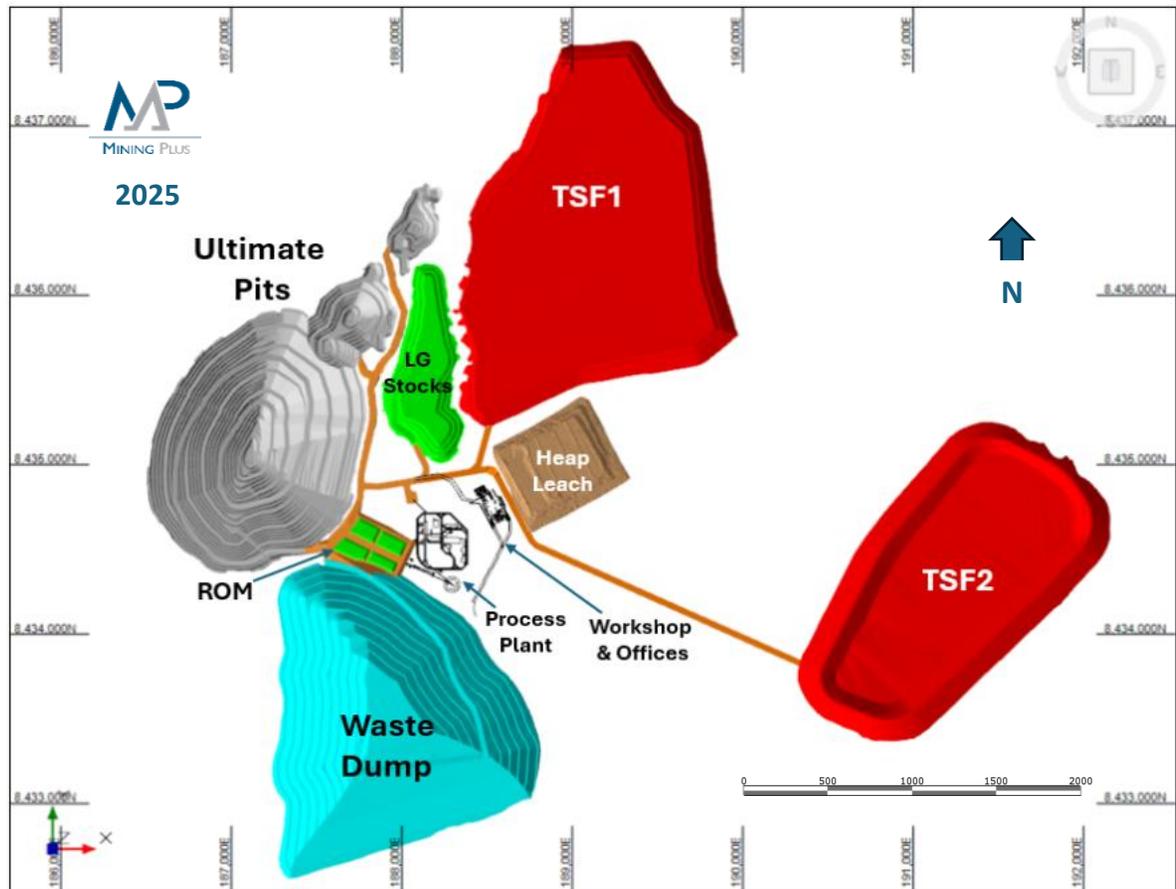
Mt Todd Ultimate Pit Design and Mine Layout
